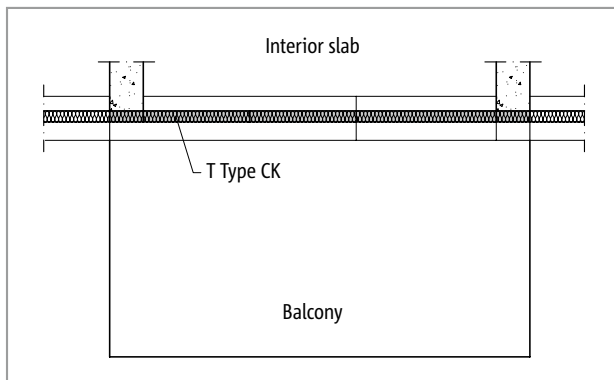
Schöck Isokorb® T Type CK: Cantilever balcony
